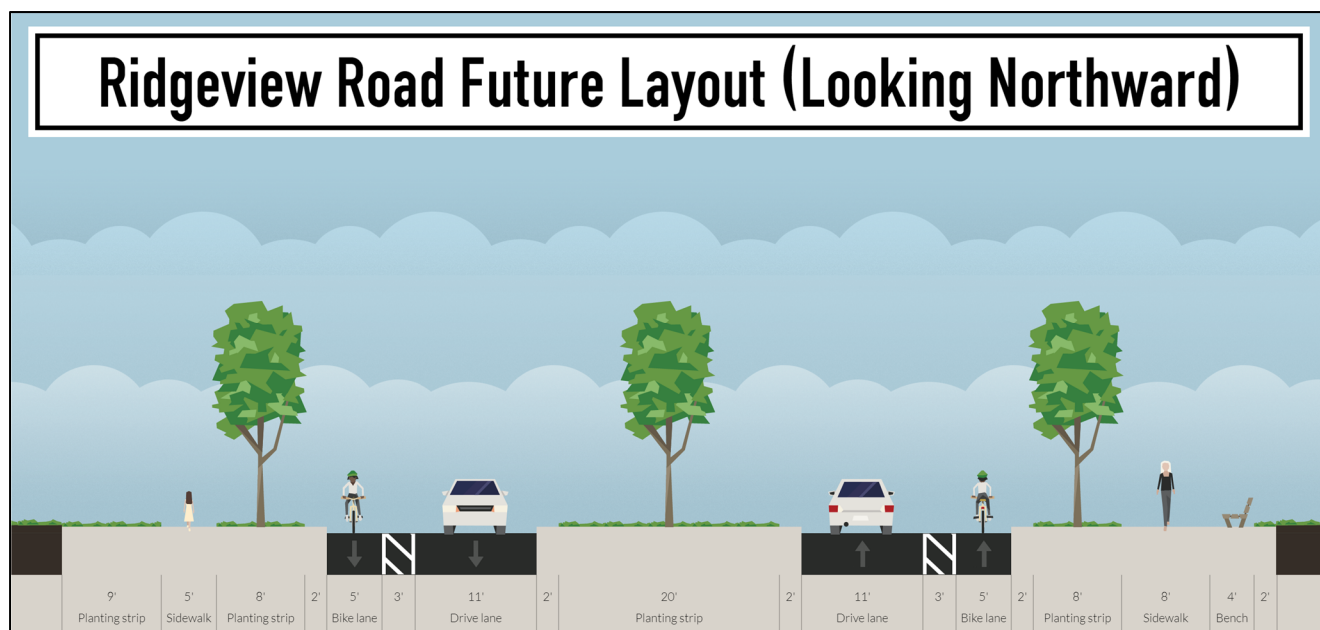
Recommended Cross-Section for Ridgeview Road as a Separated Facility
